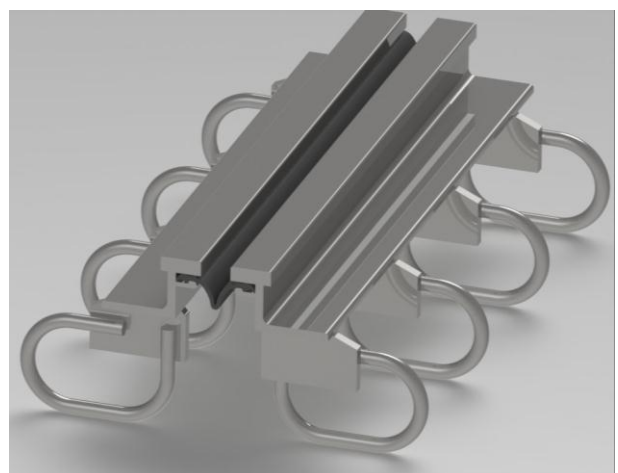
Single gap joint with standard loop anchorages in normal concrete, for asphalted road surface
